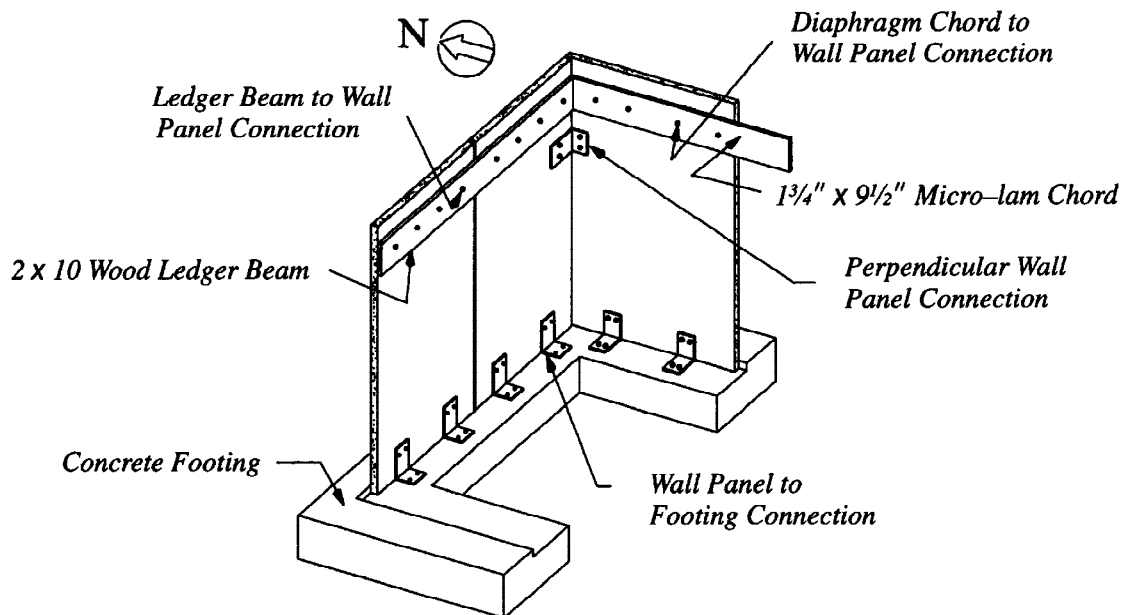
Connections between Primary Structural Components in Specimen TU1
